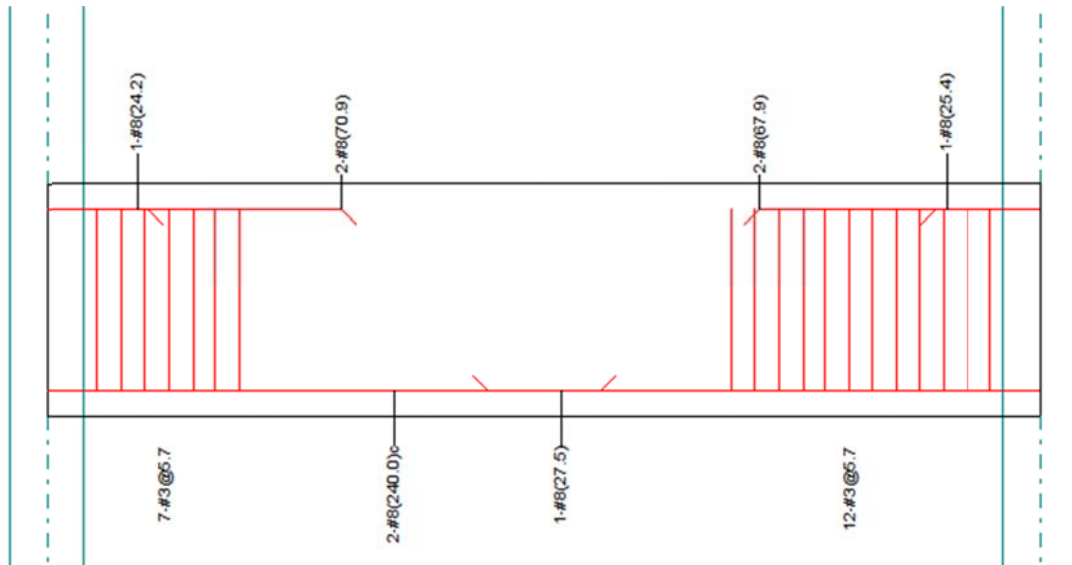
spBeam Transfer Girder 4 Reinforcing Diagram
